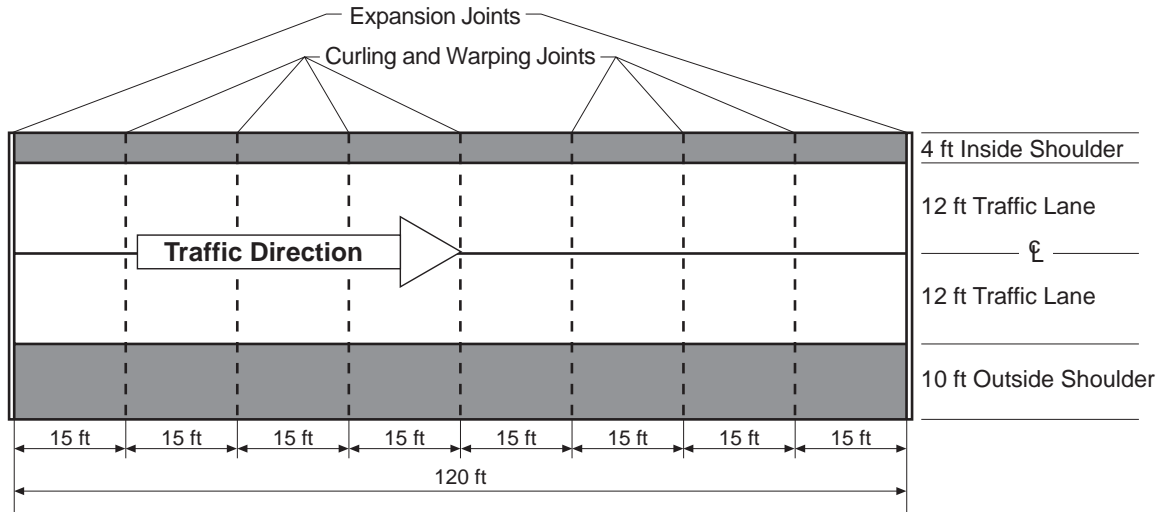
Plan view of pavement section on IH35 southbound near West, Texas
